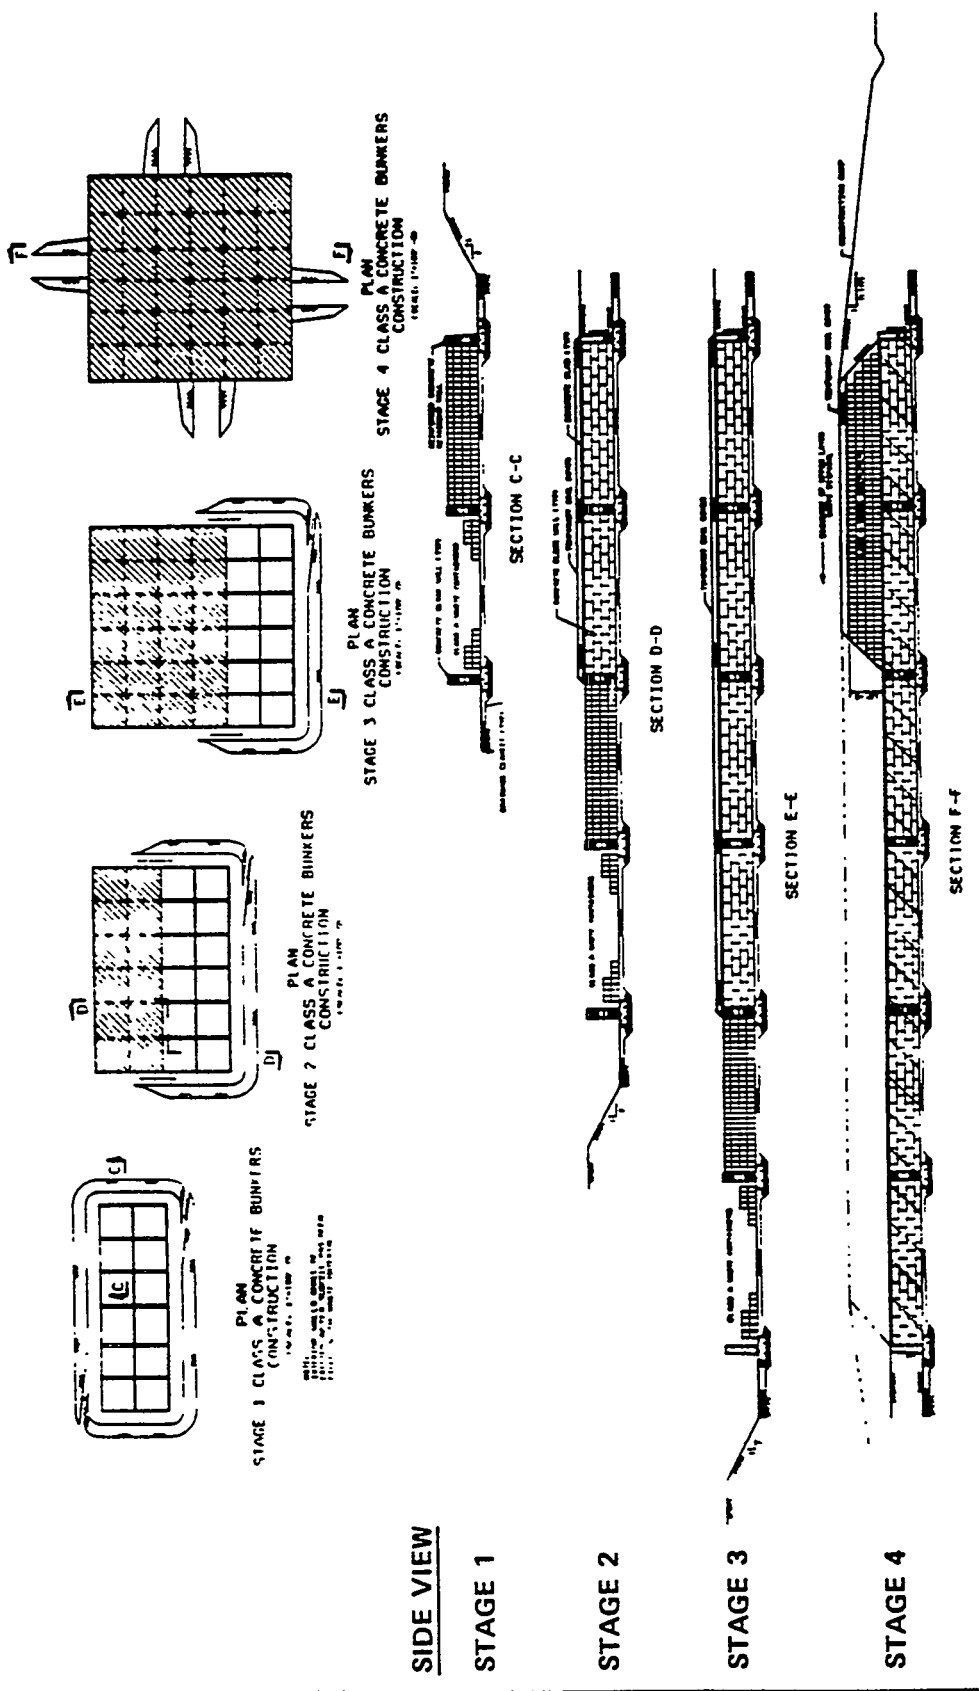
DISPOSAL FACILITY SITE PLAN
